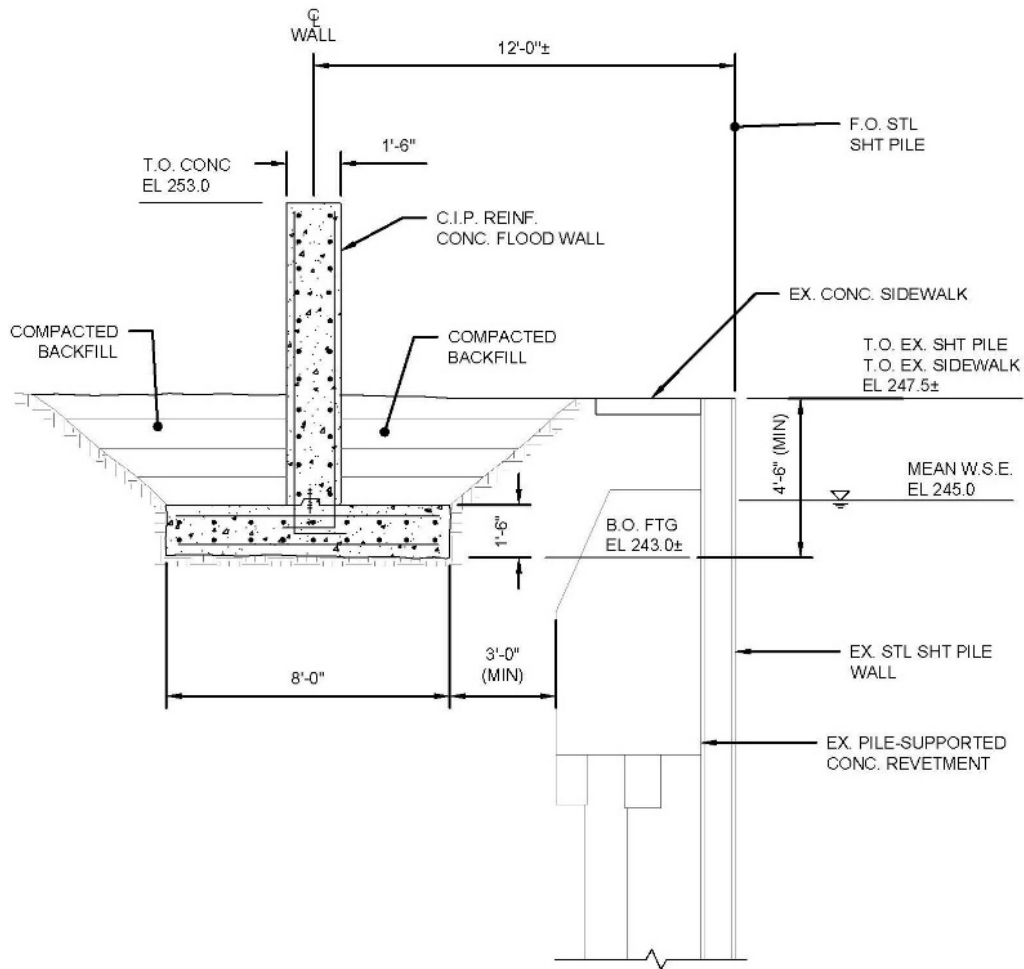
US Coast Guard Station: Flood Wall Detail at Boat Slip Side Walls
